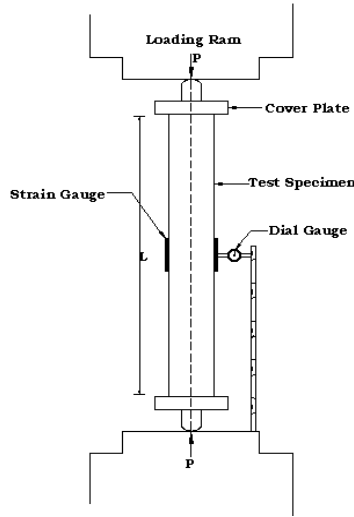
Test set up of Concrete Filled Steel Tubular Column
